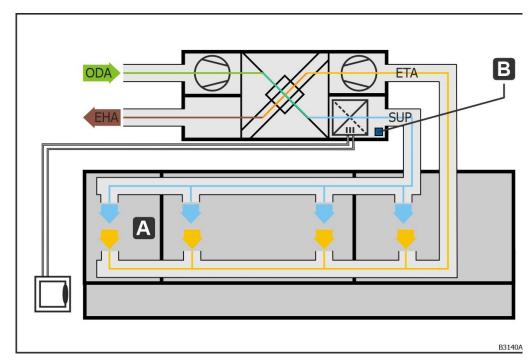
AHU with split outdoor unit and ventilate rooms with refrigerant sensor
